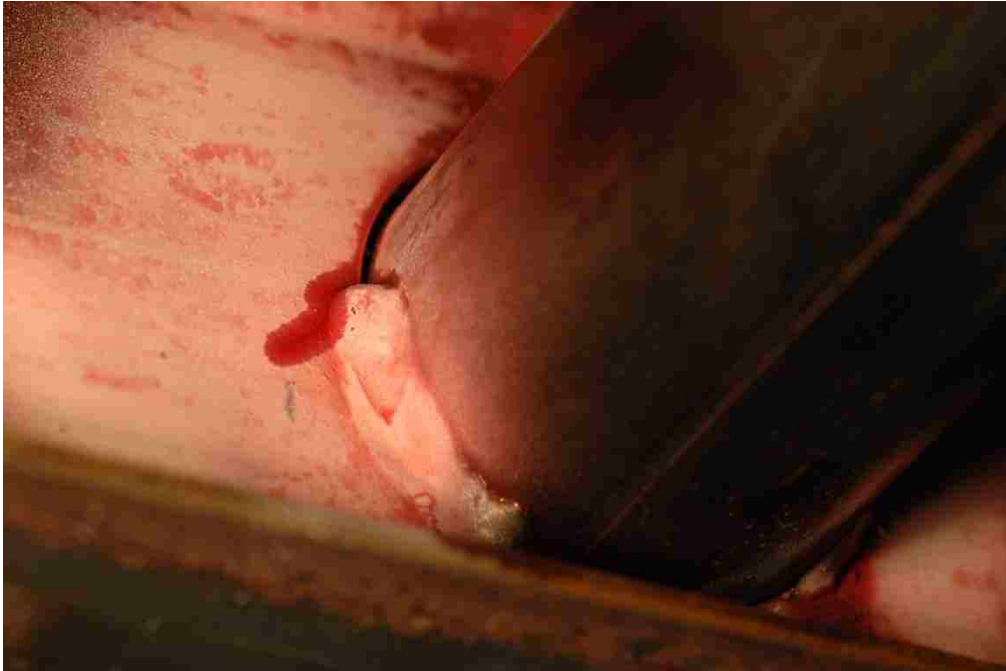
Specimen #2, crack at east weld of the S8-T1 intersection
